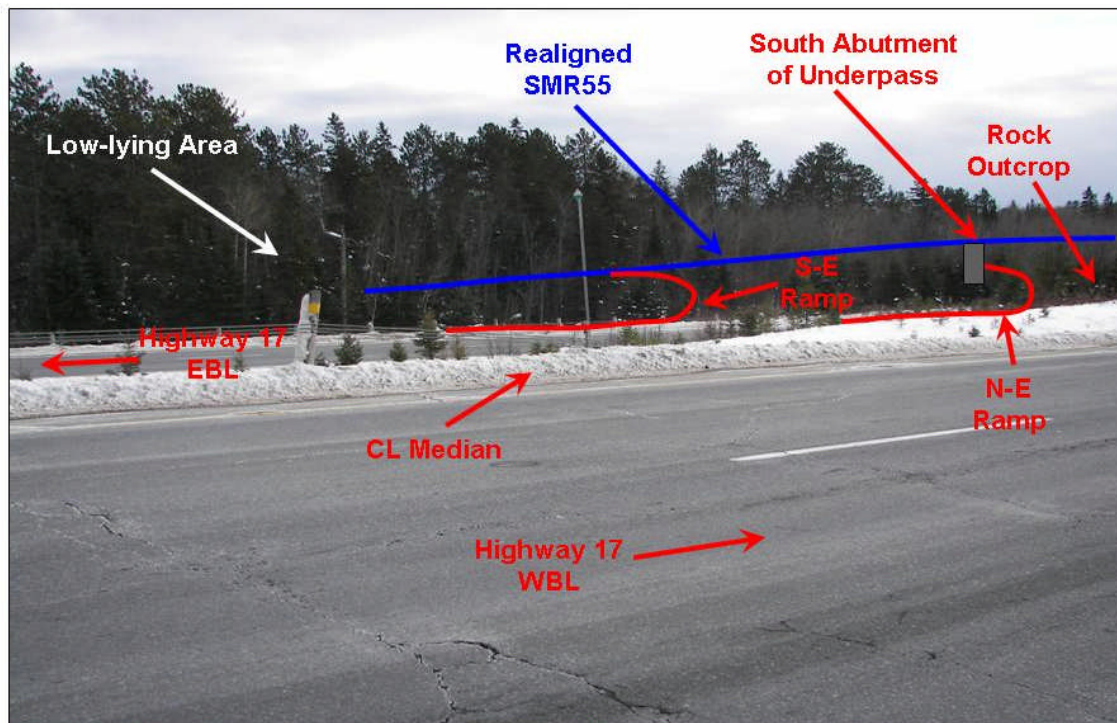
VIEW: Looking east from north shoulder of Highway 17 WBL about 600 m east of existing SMR3 Underpass. Rock outcrops illustrated in previous photograph are in the distance right of photograph. Foreground left show a low-lying swampy area where sections of the S-W Ramp area E-W/S Ramp will cross. (Dec. 6, 2007)
